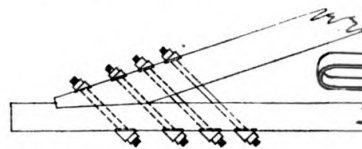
Heel joint of truss. Note absence of straps, special washers, or elaborate heel cut in timbers.
